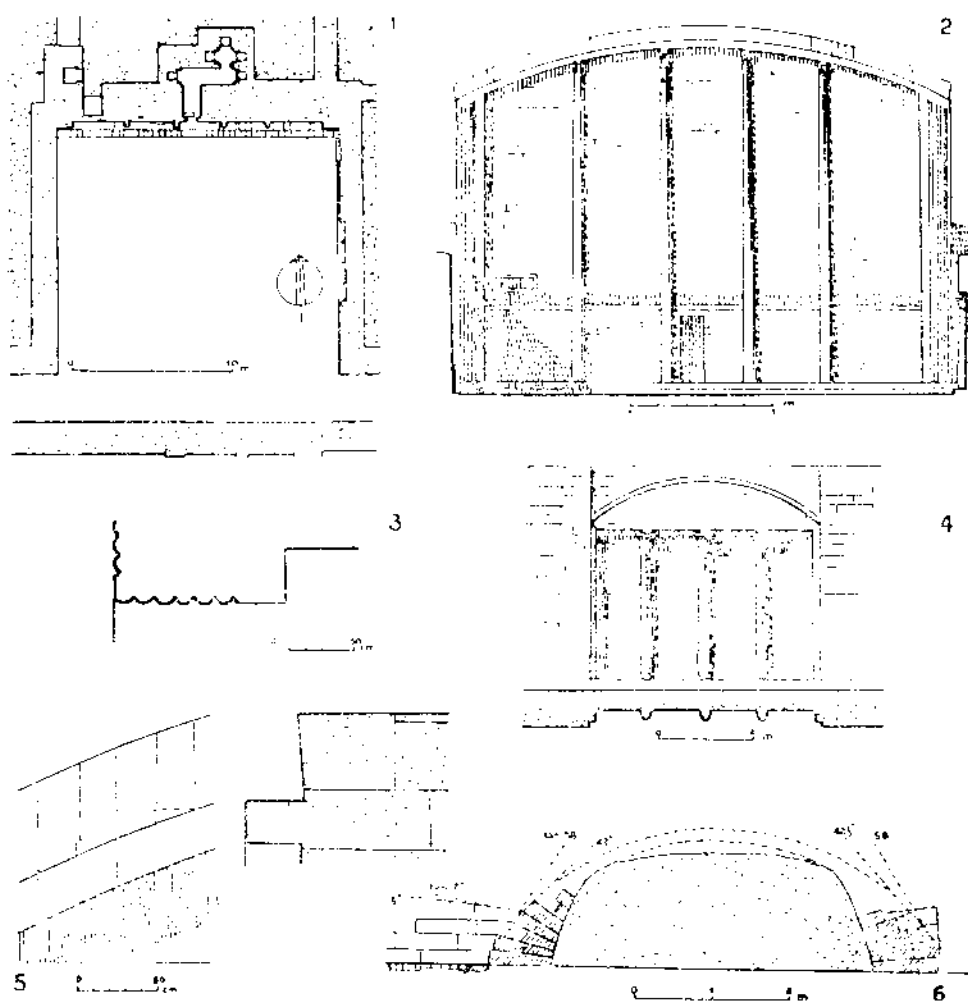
The "North Palace" in Djoser's complex: plan (1), restored elevation of "North Palace" (2), detailed section of corner-pilaster (3), restored elevation of dummy façade symbolizing the North (4), details of curved cornice (5) and transversal section of dummy vault (6)
